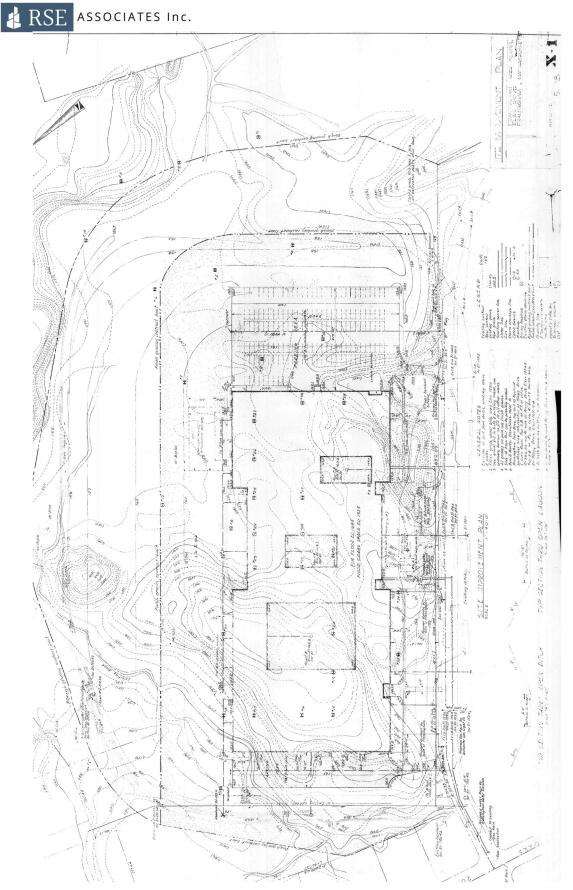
Site Plan showing 1956 Existing and Proposed Site Grading
